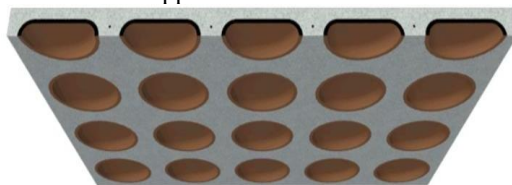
Building a rib filler slab, demonstrating the concrete pouring, filler material placement, and reinforcement
